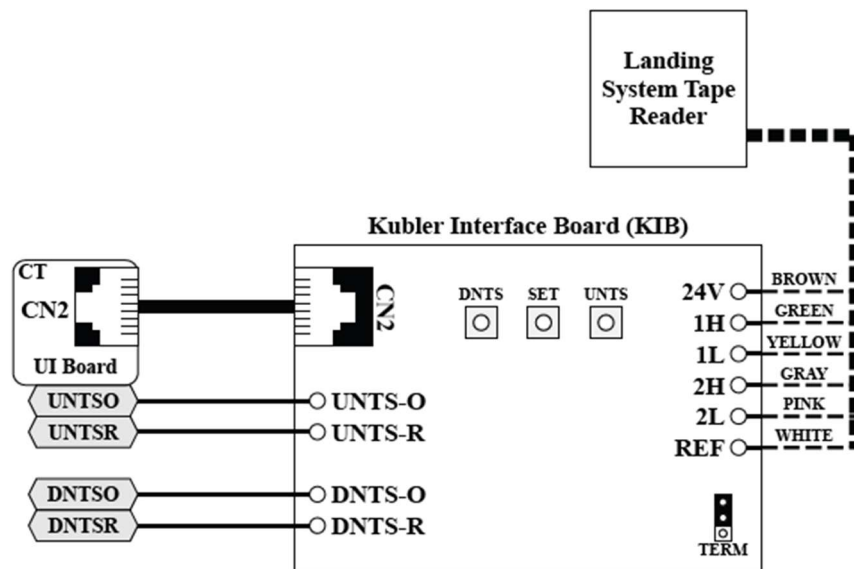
Dual Head Sensor Wiring / KIB Board Wiring
